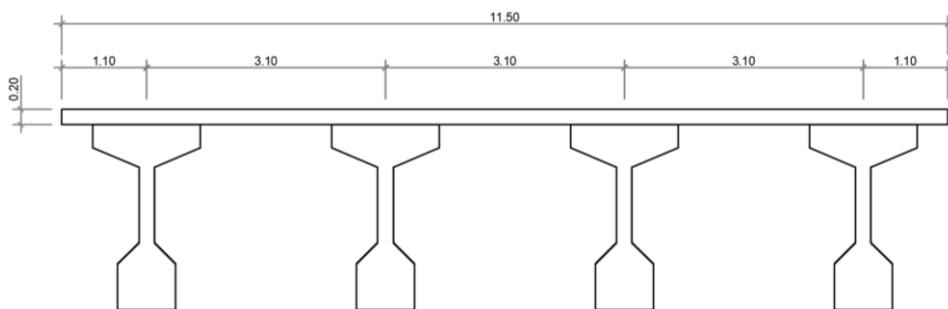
Cross section of the bridge with 40 m of span. Dimensions in m.
